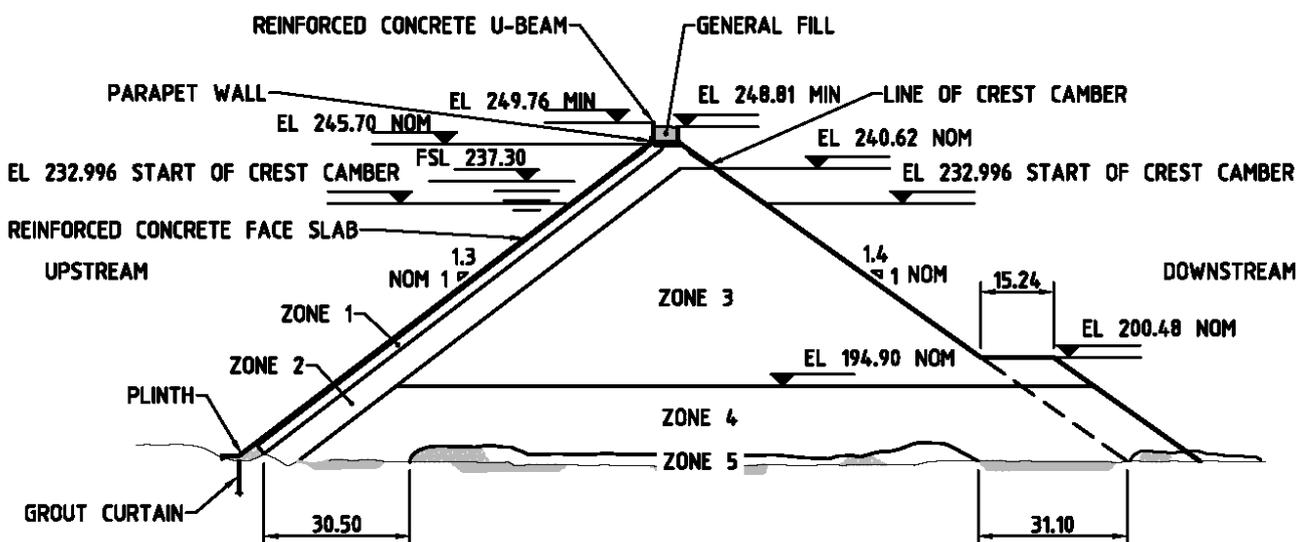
Typical cross section of the original embankment showing zones (includes 1983 raising)
